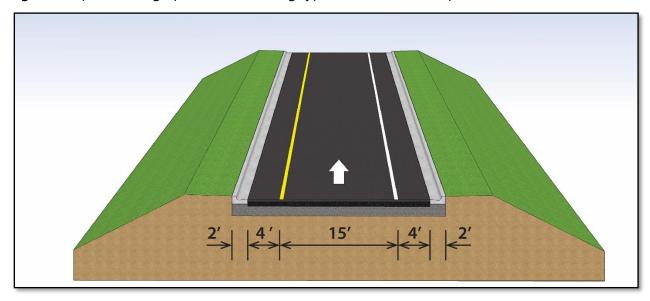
Existing Typical Section – Exit Ramp 6A
